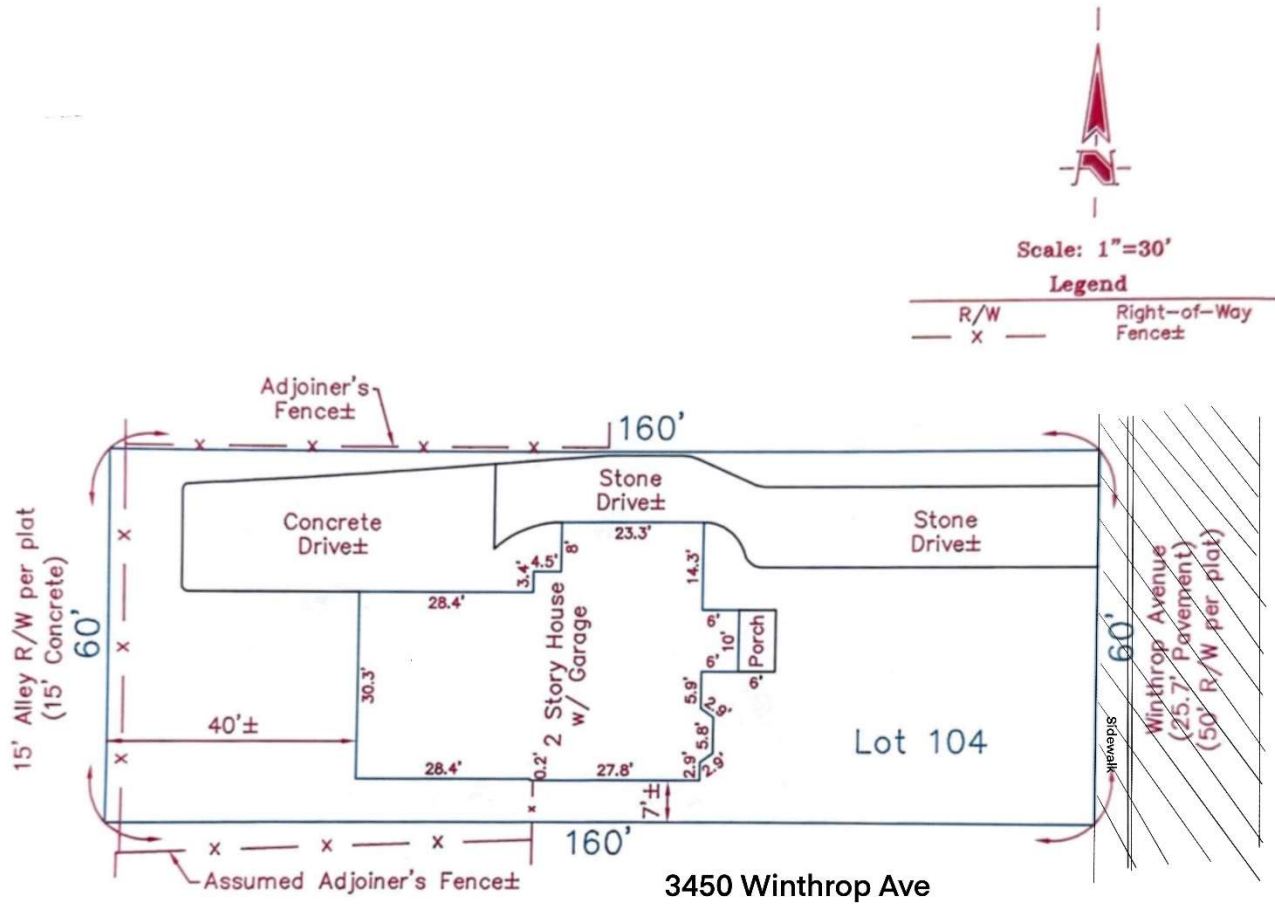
Site Plan for 3450 Winthrop Ave.
